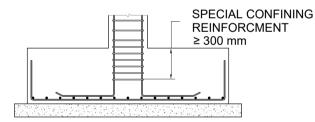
PROVISION OF SPECIAL CONFINING REINFORCEMENT IN FOOTING
